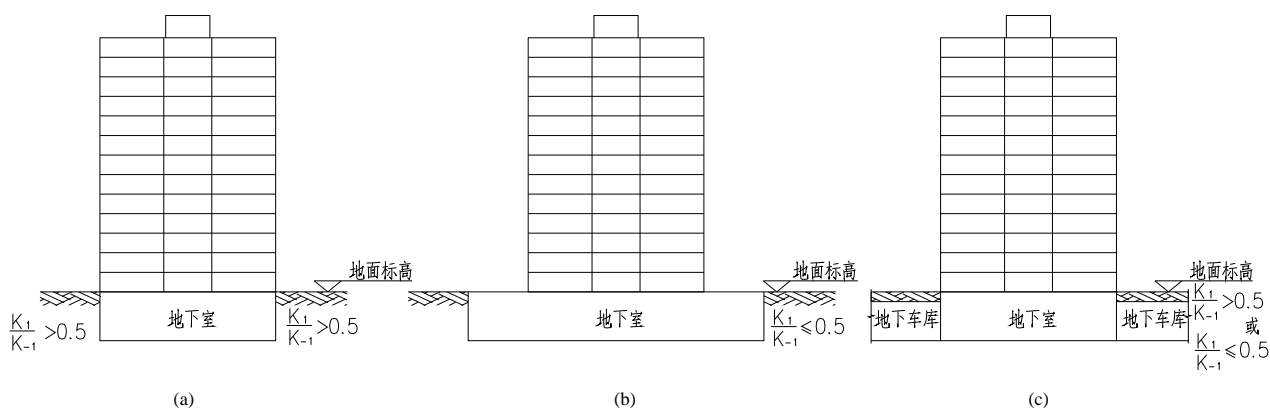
(a) Underground area does not expand; (b) underground area expands (c) underground connected with garage
